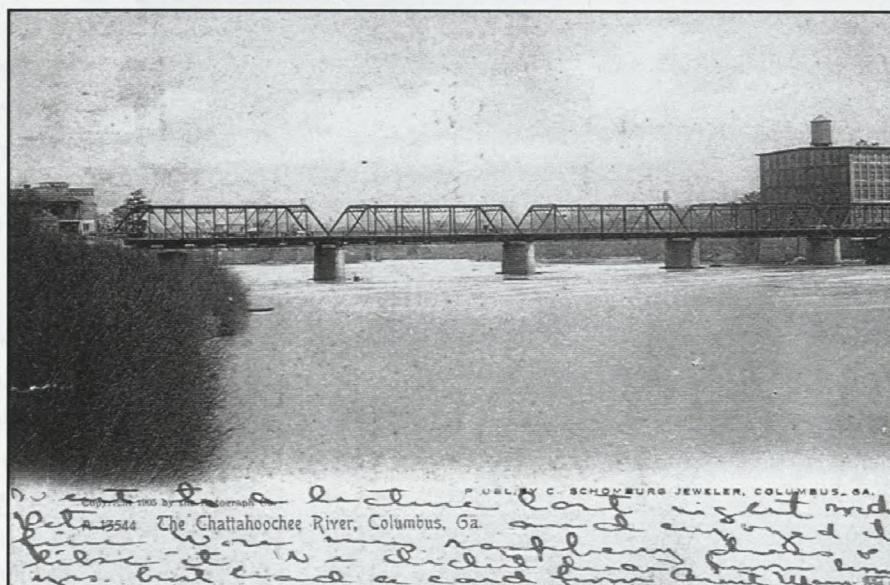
Fourteenth Street Bridge on the Chattahoochee River.
